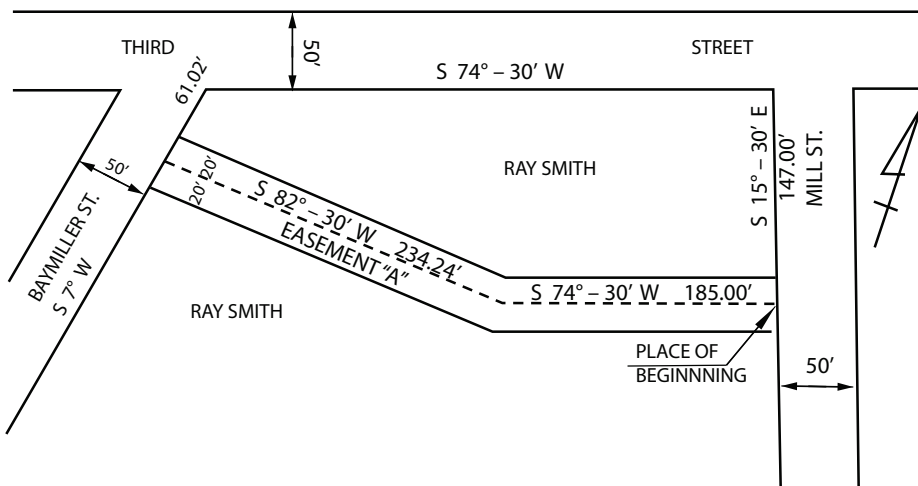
Centerline Plat for Aerial or Underground Utilities
